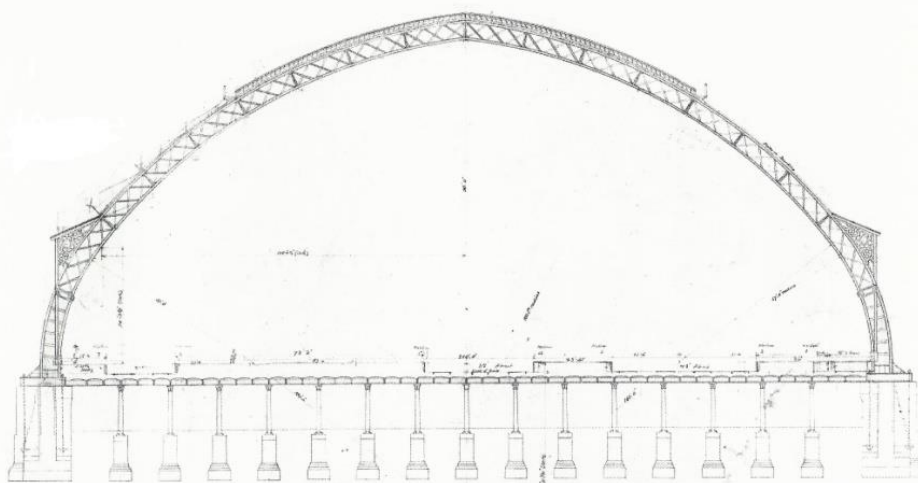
A cross section of the St. Pancras train shed 1865. (Lansley, *et al* 2008)
